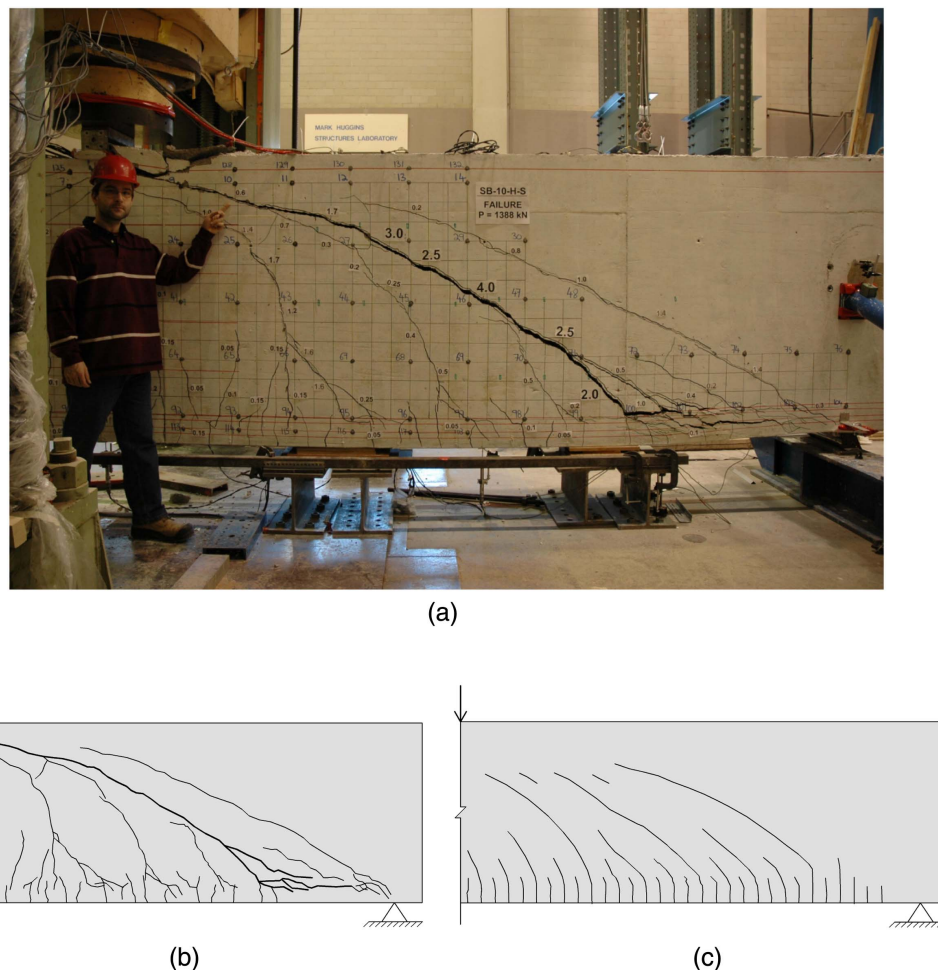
Crack patterns of L-10HS at failure: (a) Sherwood standing beside tested specimen; (b) observed crack pattern; and (c) crack pattern from finite-element analysis using proposed method.
